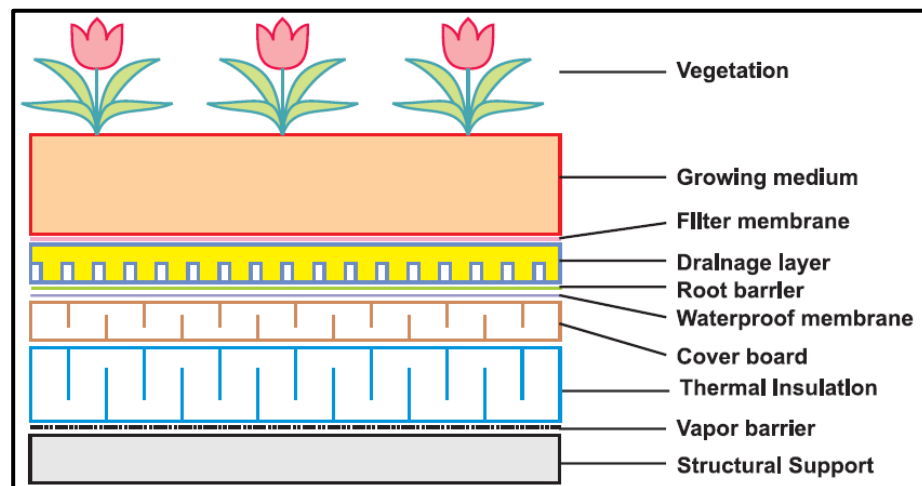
Typical Green Roof Construction (Wong and Hogen, 2011)
